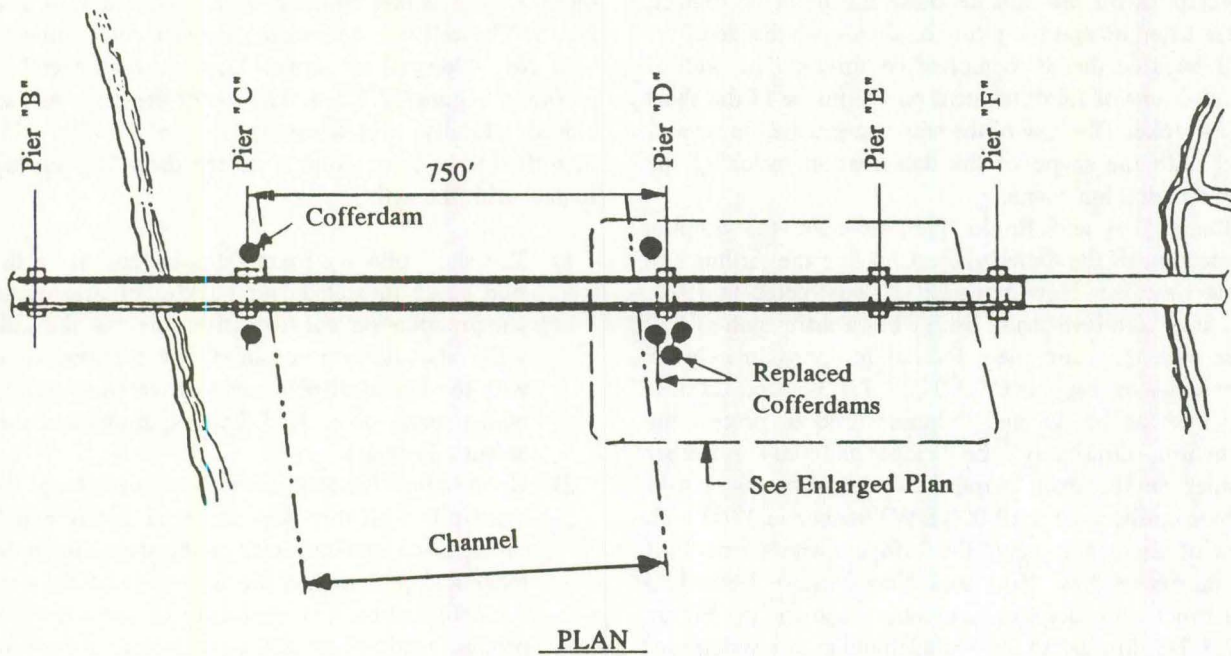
Plan of Dolphin Protection System for the Outerbridge Crossing of the Arthur Kill Waterway, New York [5].
